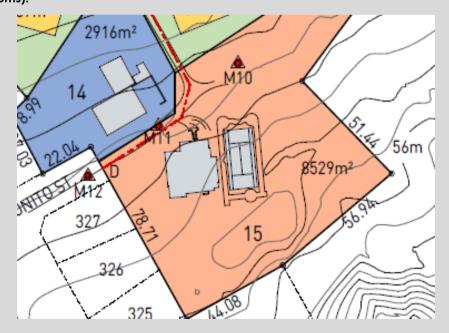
Proposed zoning for existing structures to be converted and incorporated as part of the development.
